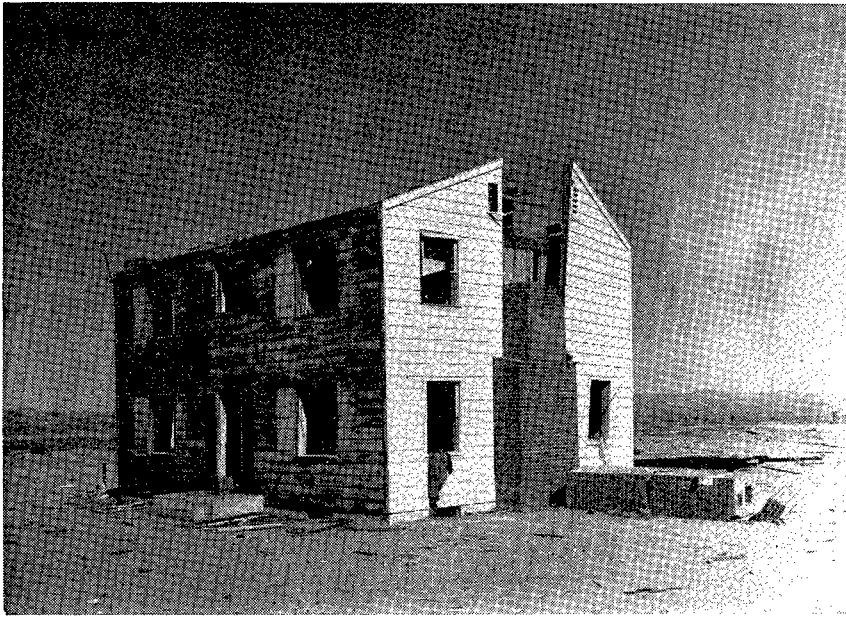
Redesigned Frame Residence (After)—Although certain of the redesigned features performed well, the strengthened superstructure of this frame dwelling was still inadequate. It would not be suitable for occupancy.
